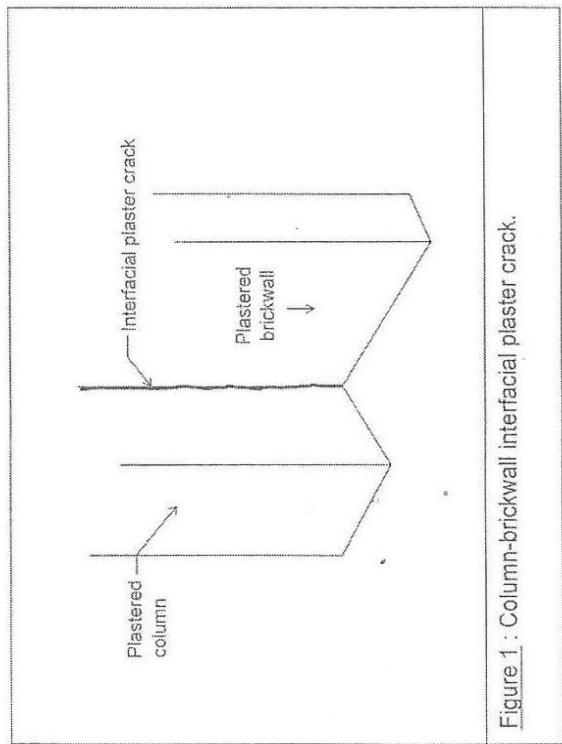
Column-brickwall interfacial plaster crack.
